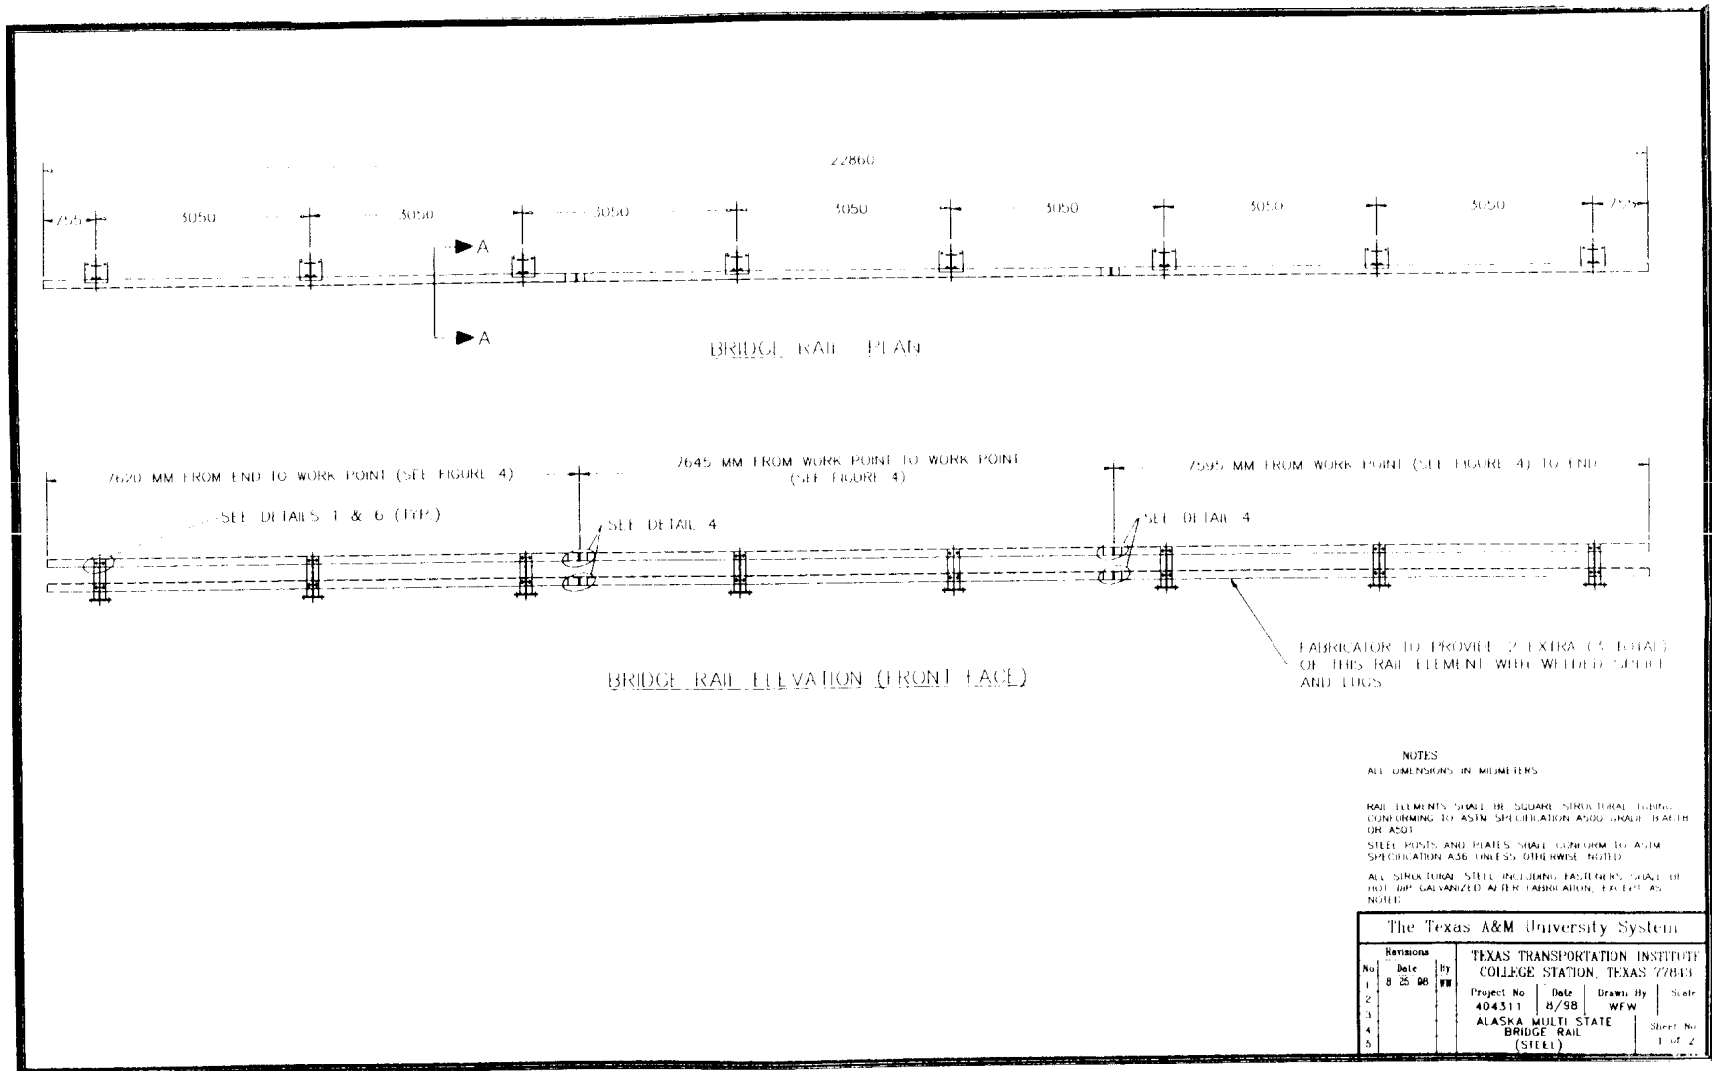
Details of the Alaska Multi-State Bridge Railing mounted on the curb (steel).
